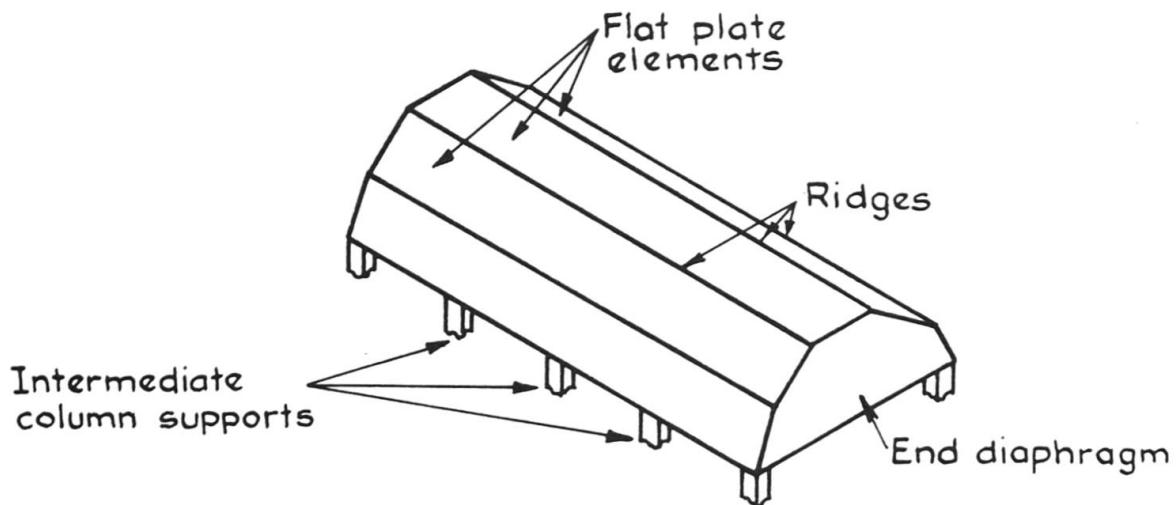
A TYPICAL FOLDED PLATE STRUCTURE
